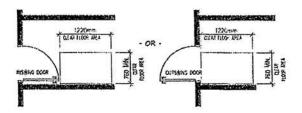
CLEAR FLOOR AREA BEYOND SWING OF DOOR
